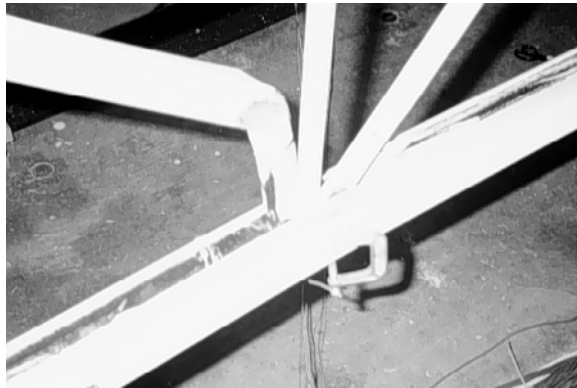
Failure Mode for 26K5-ND East Joist
